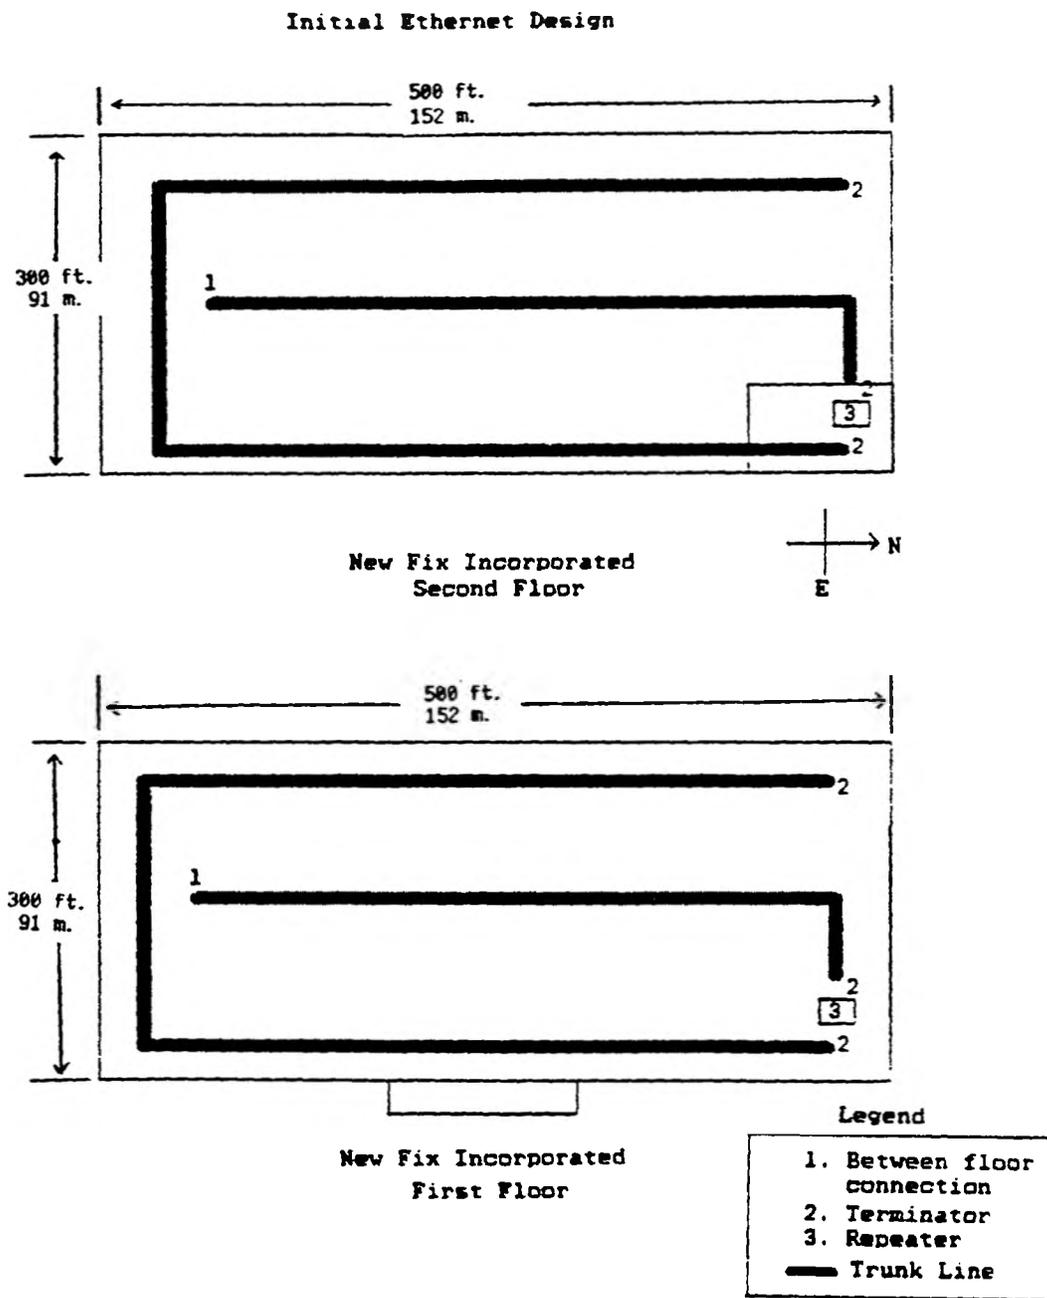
DESIGN STUDY (NEW FIX INCORPORATED) FLOOR PLAN
